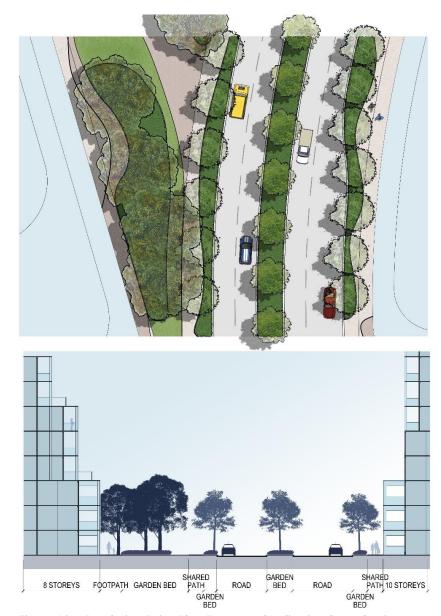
Resolution Drive Plan Extract and Indicative Cross-Section
